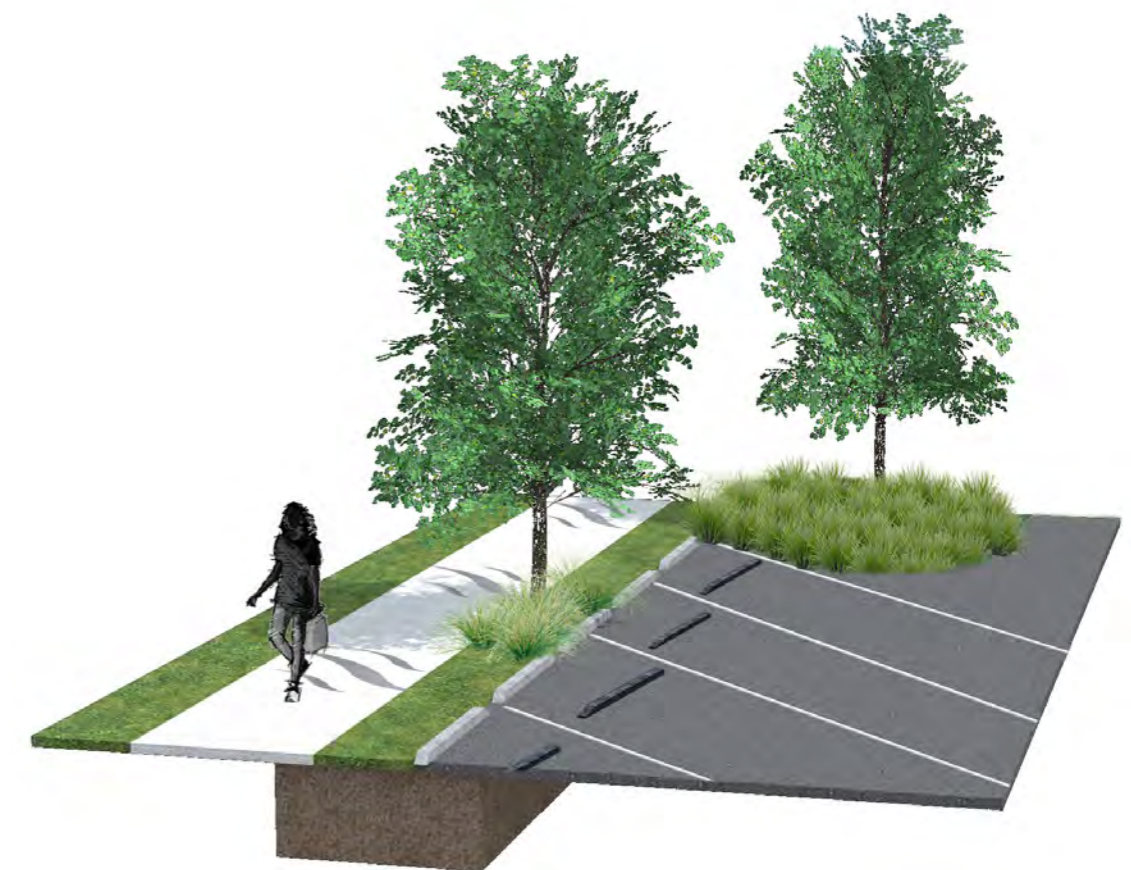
TYPICAL STREET TREE PLANTING - TOOWOON BAY ROAD
